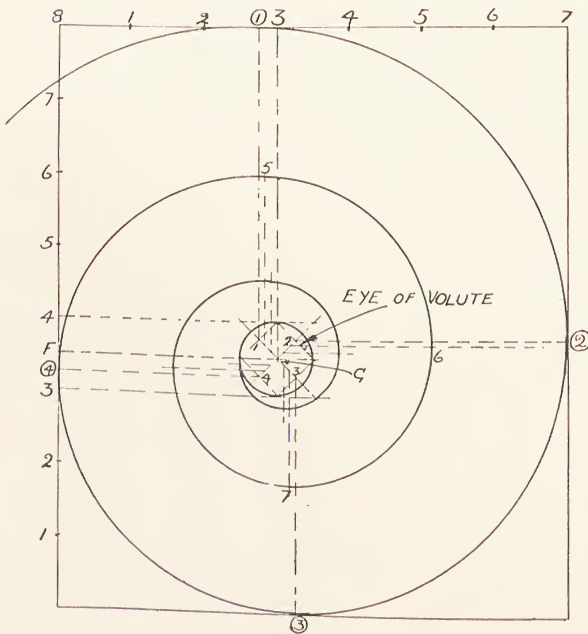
SETTING OUT OF IONIC VOLUTE.
